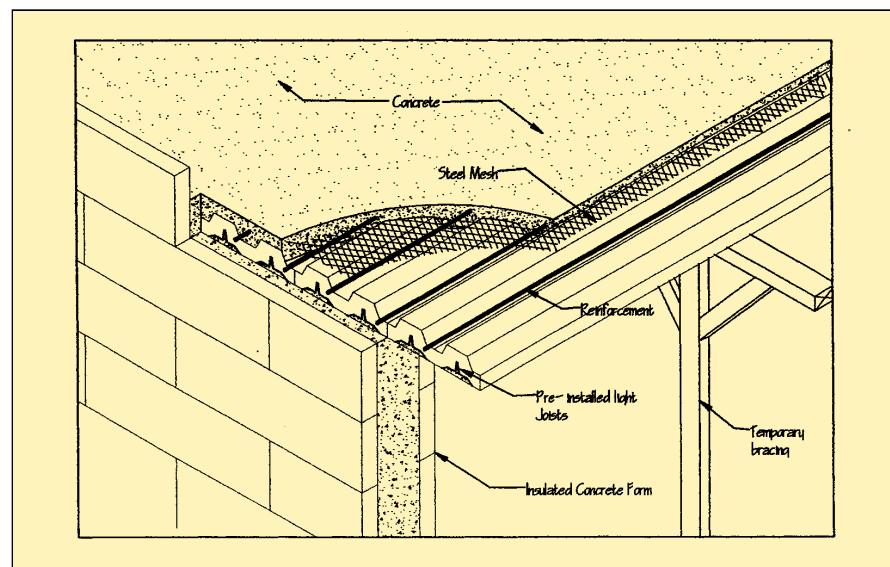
Cutaway view of a concrete slab-and-joist deck created with a foam form system.
